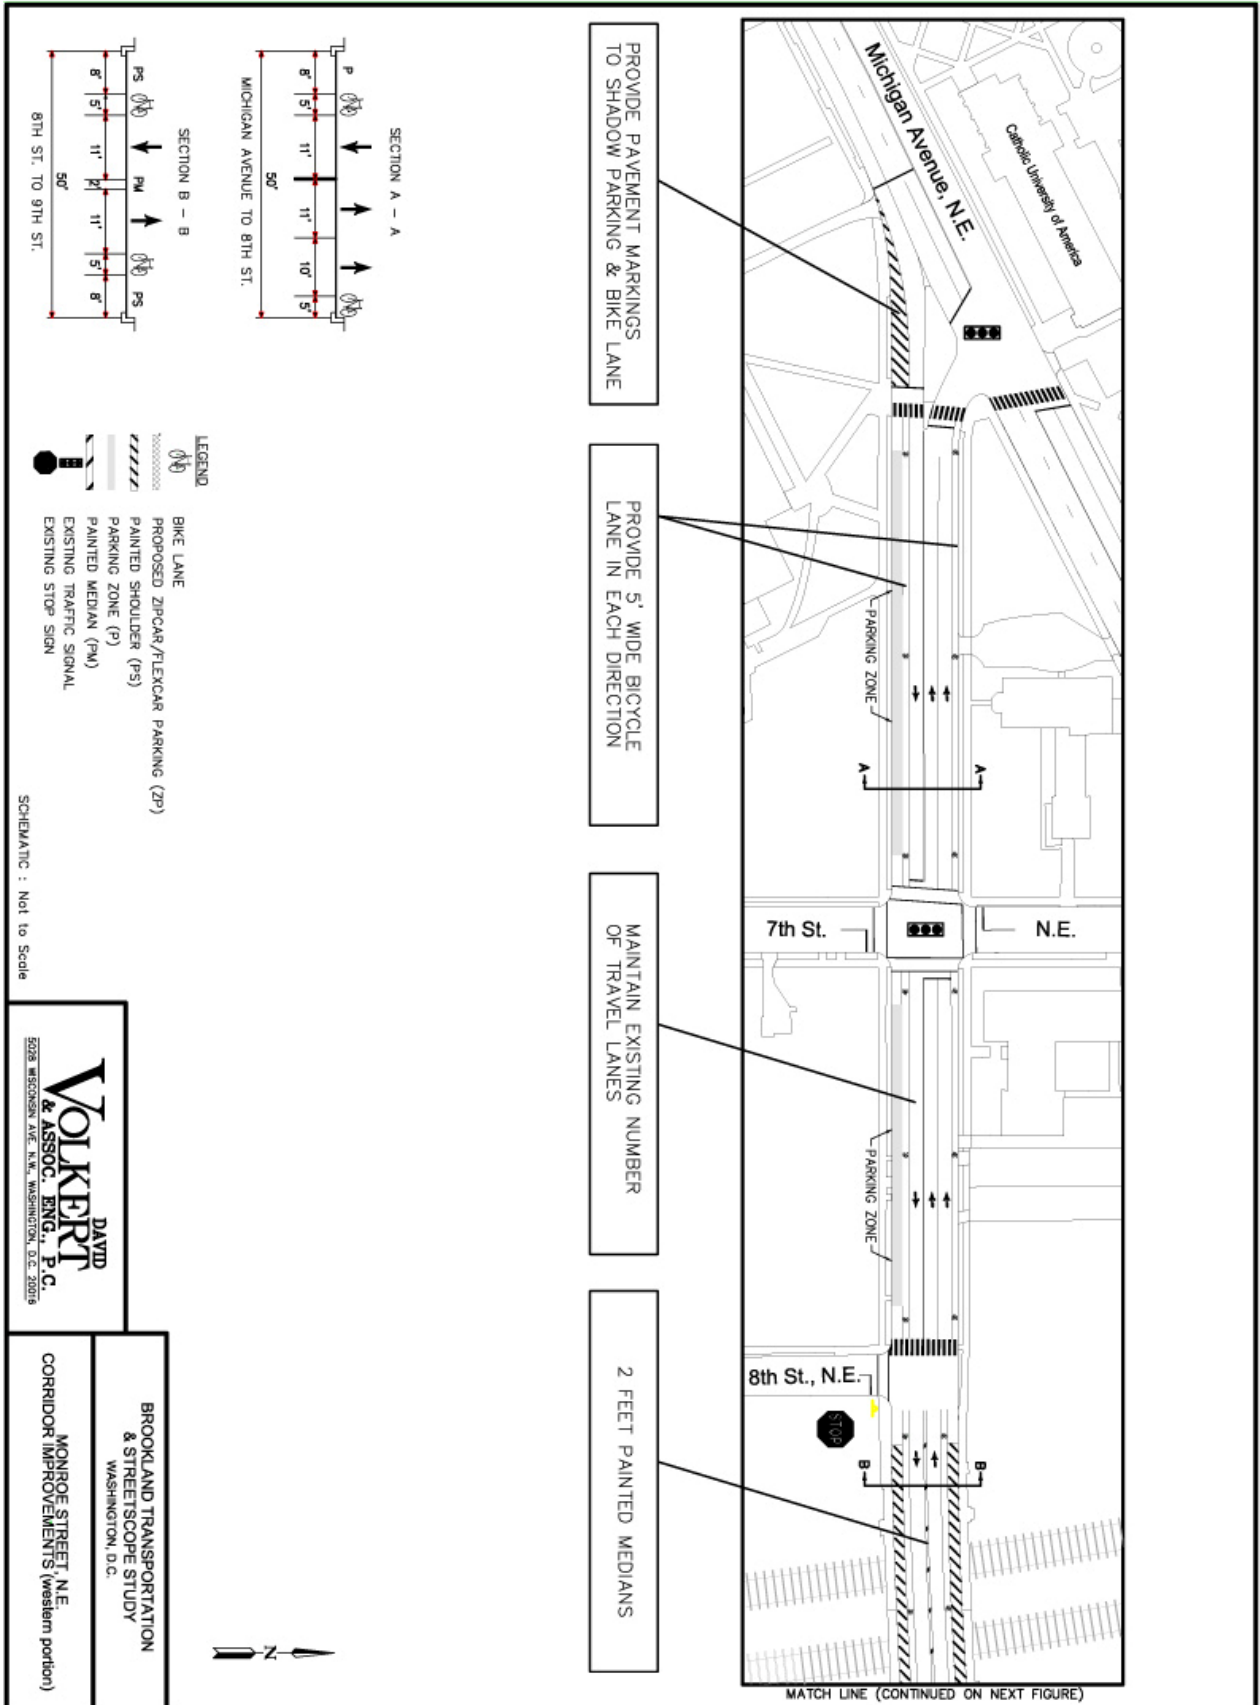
Conceptual Plan of Proposed Improvements along Monroe Street between the Monroe Street Bridge and 12th Street (Page 133 of Draft Final Report).
